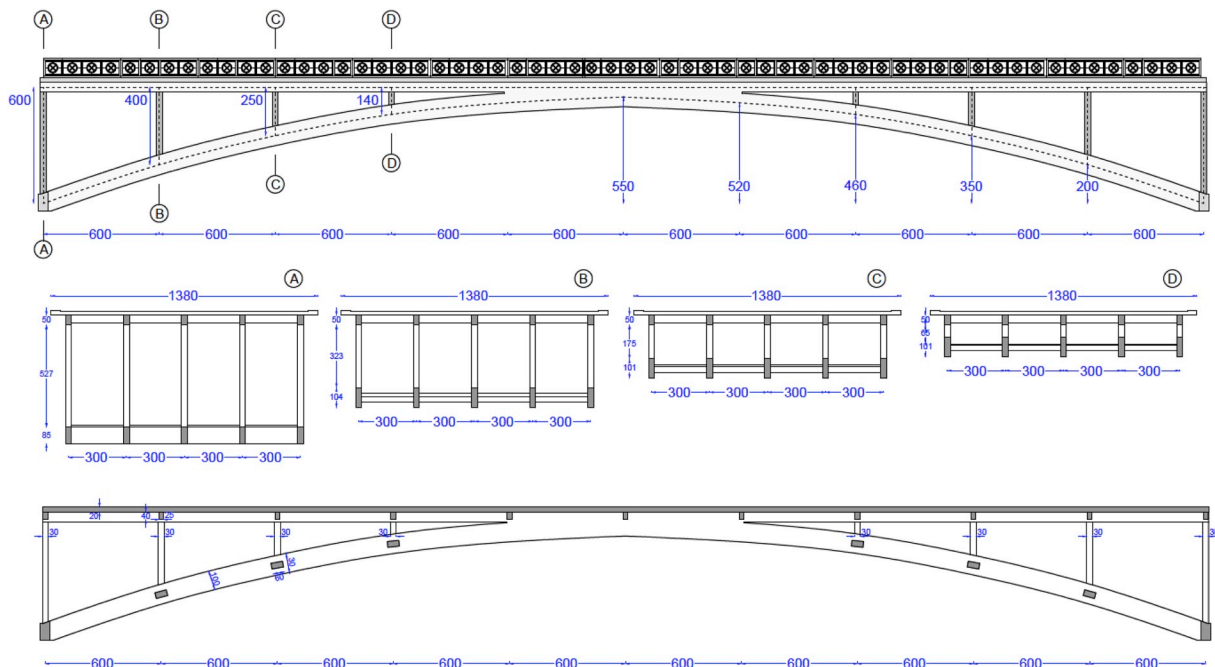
RC arch bridge: elevation, transversal and longitudinal sections.
